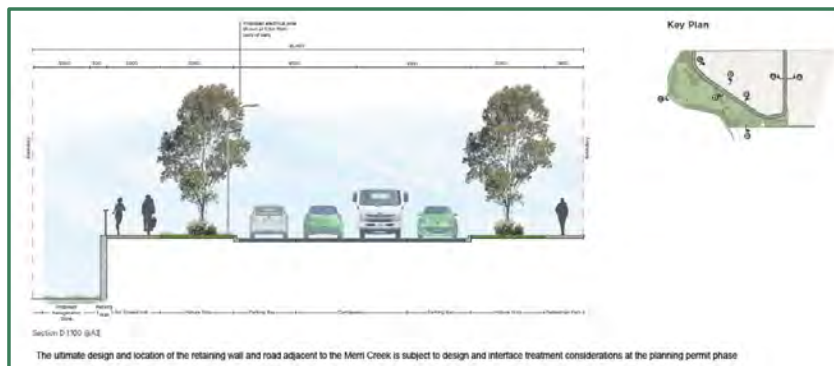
ROAD CROSS SECTION ADJACENT THE MERRI CREEK CORRIDOR
